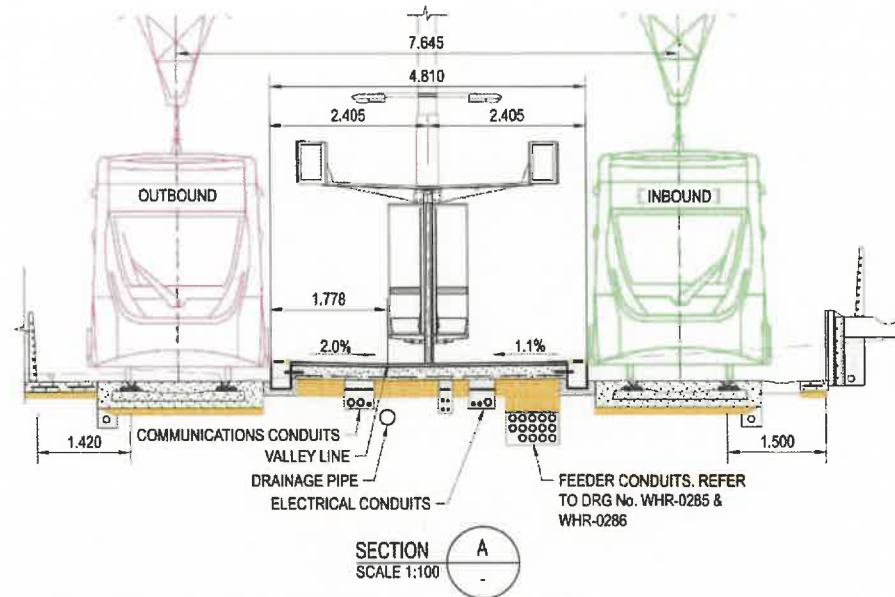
Excerpt from engineering drawings - section of tram platform showing dimensions of key elements.
